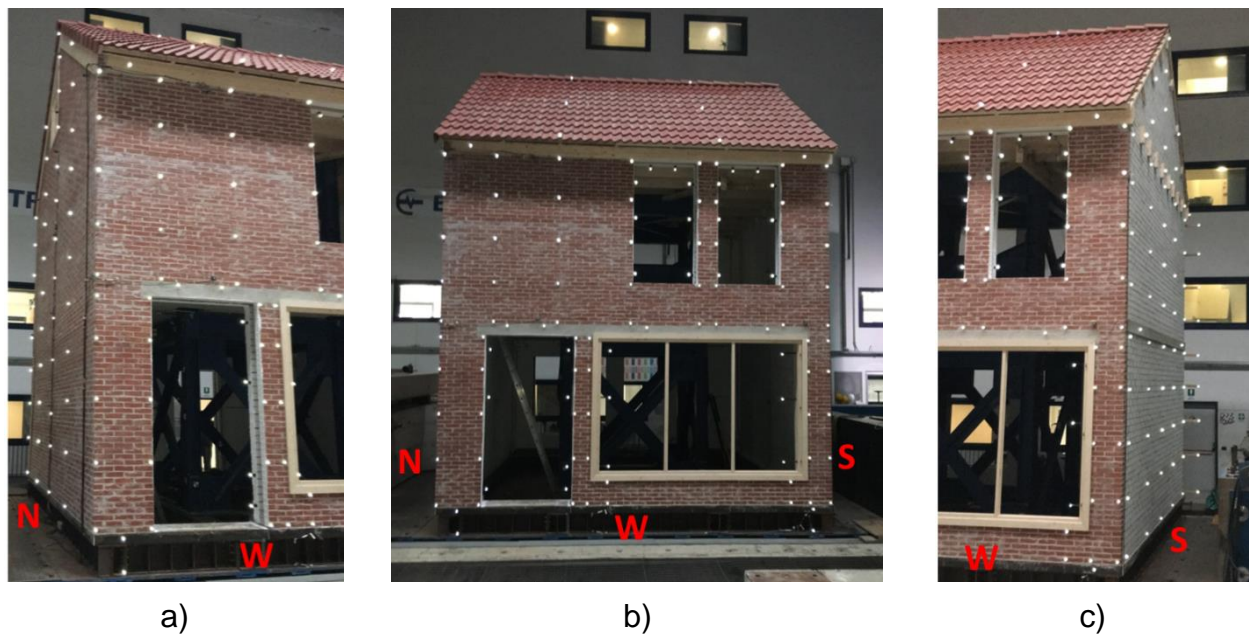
Reflective markers: a) North and West façades; b) West façade; c) West and South façades.
